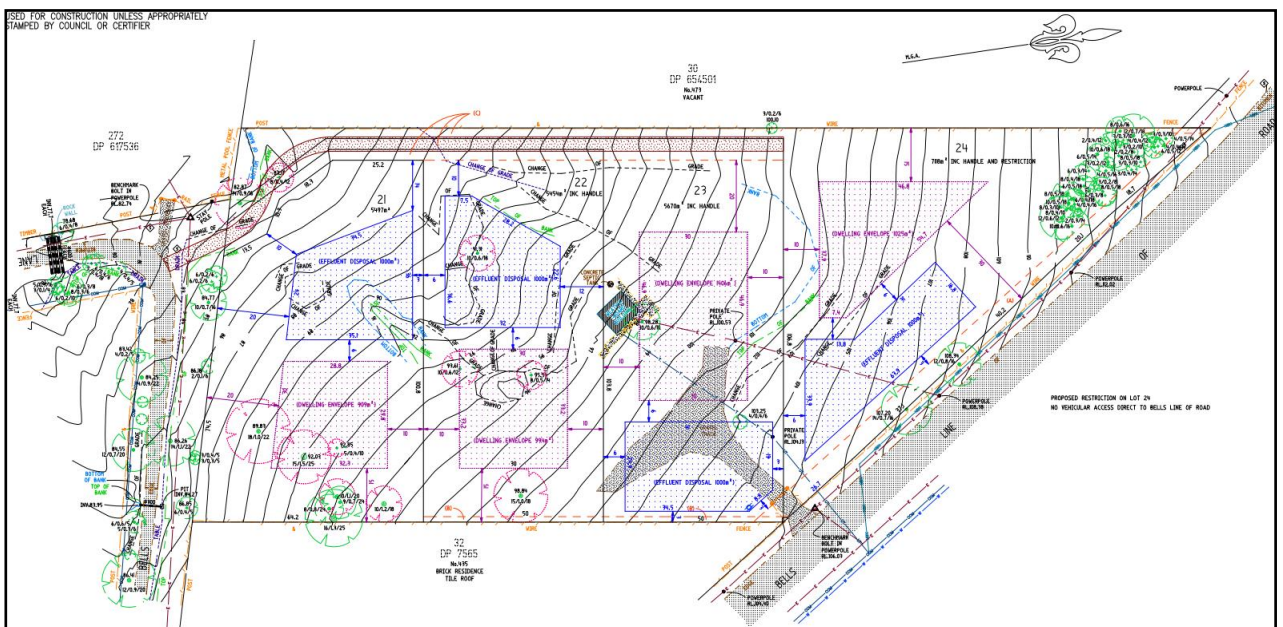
; Extract of proposed development plans ex McKinlay Morgan & Associates
